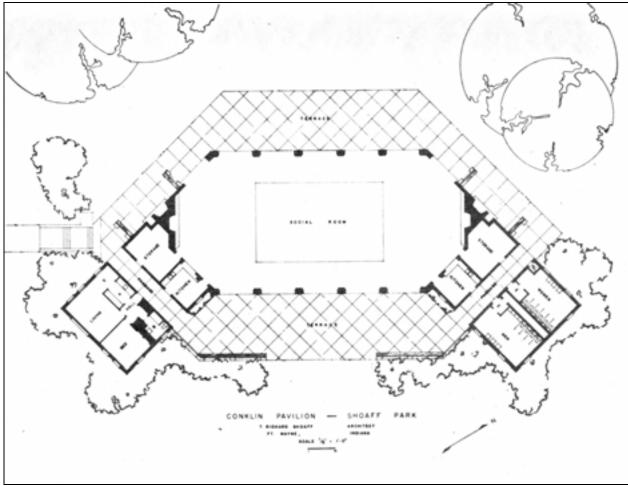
Plan of the Conklin Pavilion. The one-story building, designed by T. Richard Shoaff, was constructed of Indiana limestone and rustic timber. The central space was an open social room with terraces surrounding it. Two kitchens and storage and restrooms were available for public use. The building also had a caretaker's apartment, housed in the south wing. (R-FWP-SHO-PD-RShoaff-Conklin-Pav-ND.jpg) Courtesy Fort Wayne Parks and Recreation.
